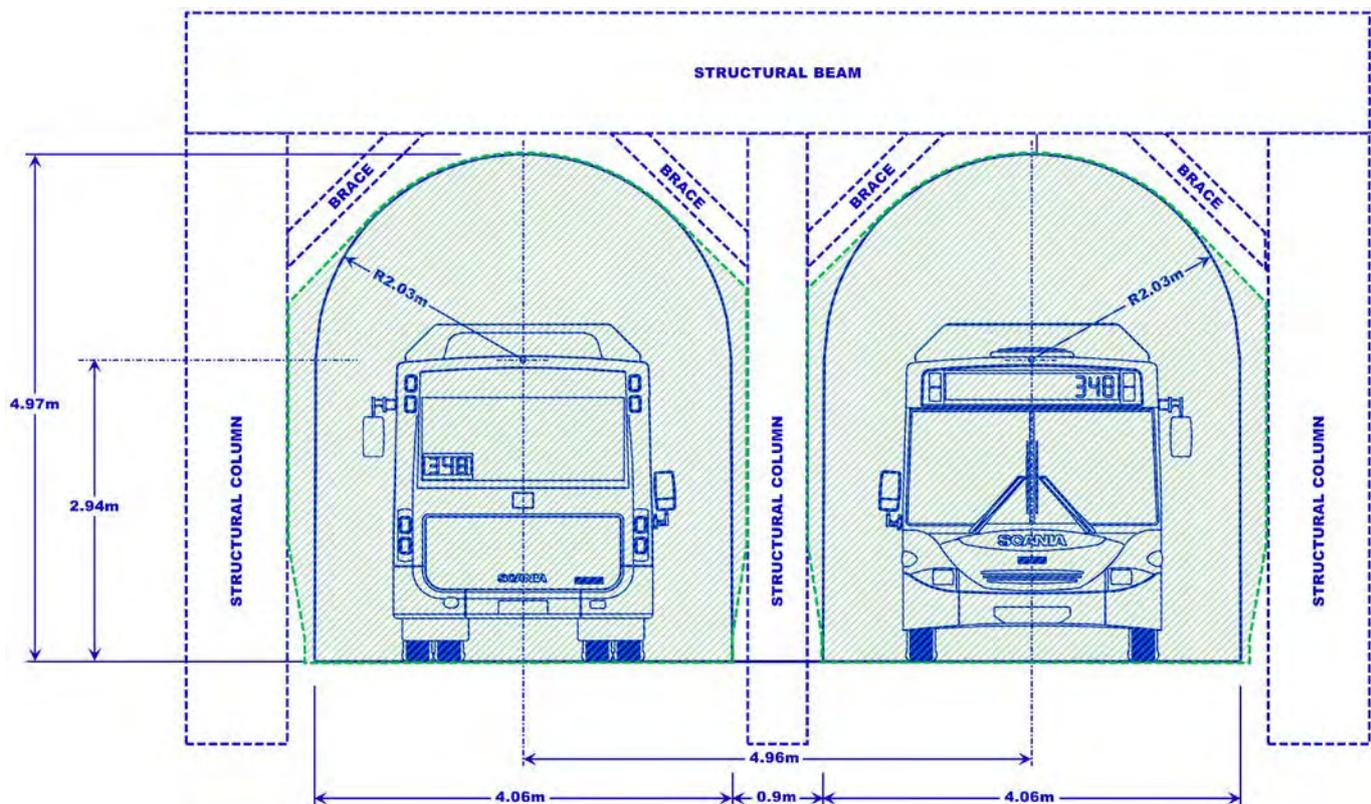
Potential Section Widening of Wynyard Tram Tunnels
